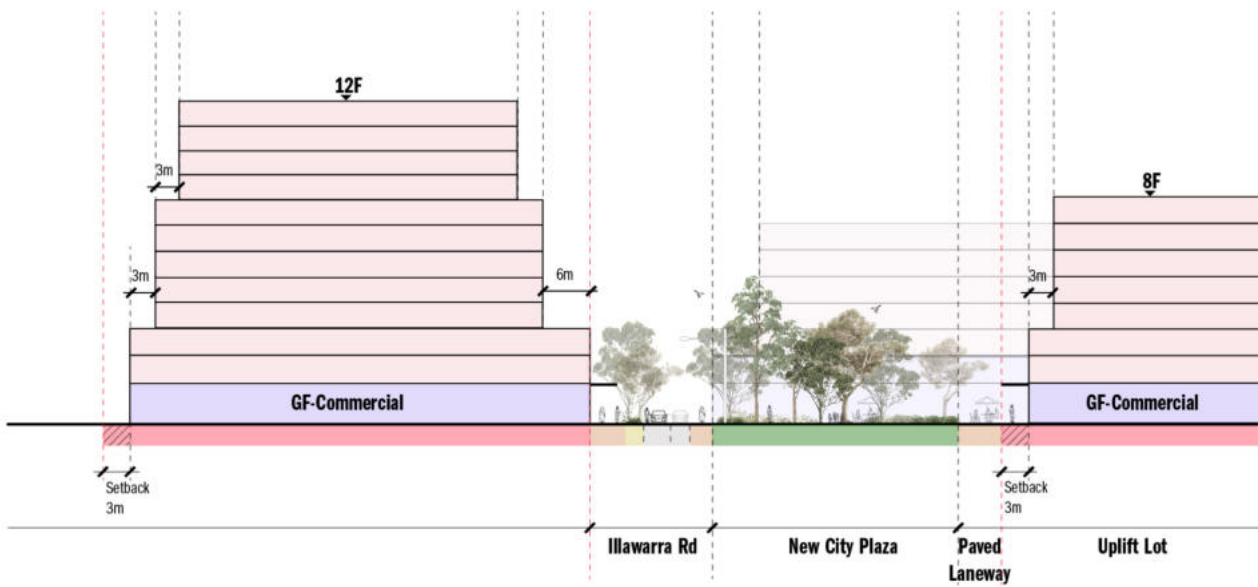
Marrickville Local Centre –Illawarra Road and New Town Plaza Section
